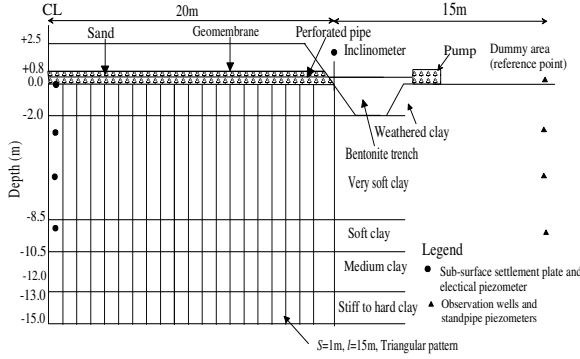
Vertical cross section of the test embankment with the subsoil profile, New Bangkok International Airport, Thailand (after Indraratna, et al., 2005b)
